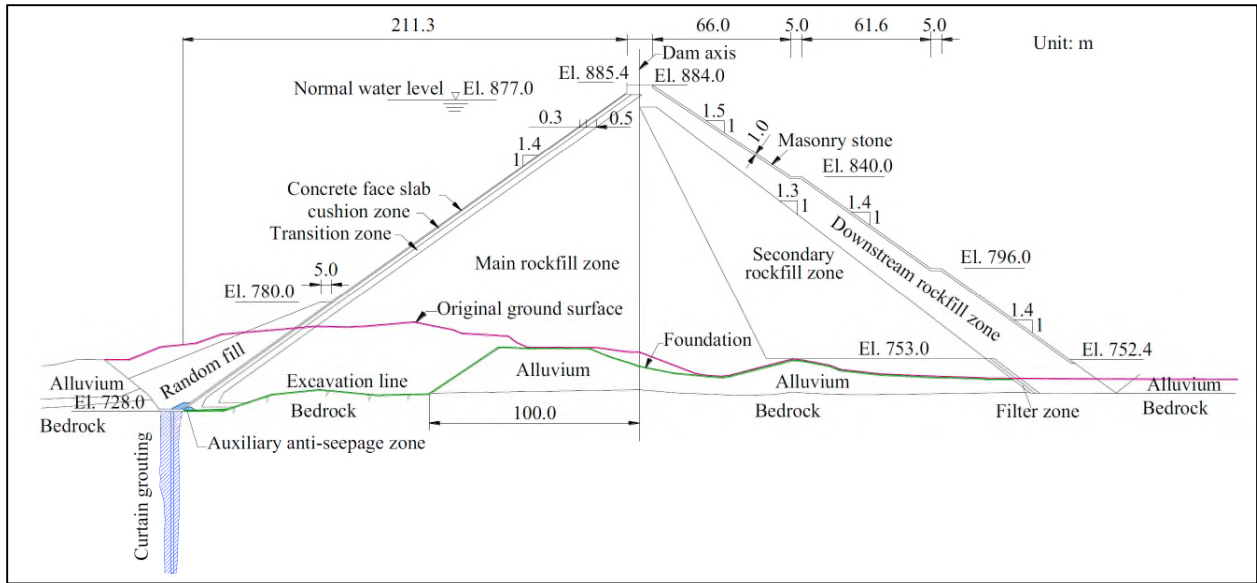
Maximum cross section of the Zipingpu dam (Zhang et al., 2015).
